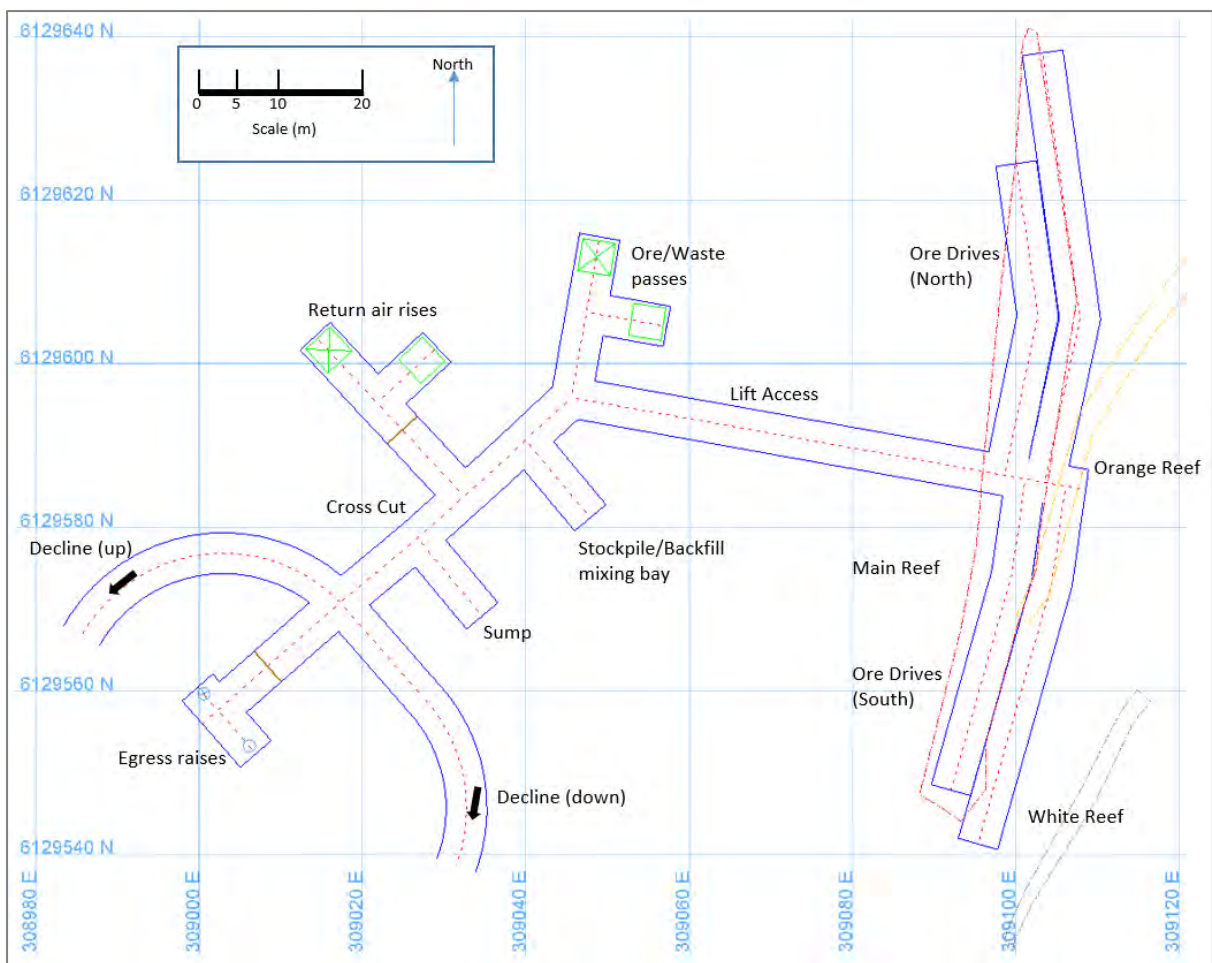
| TYPICAL LEVEL LAYOUT CONCEPT
